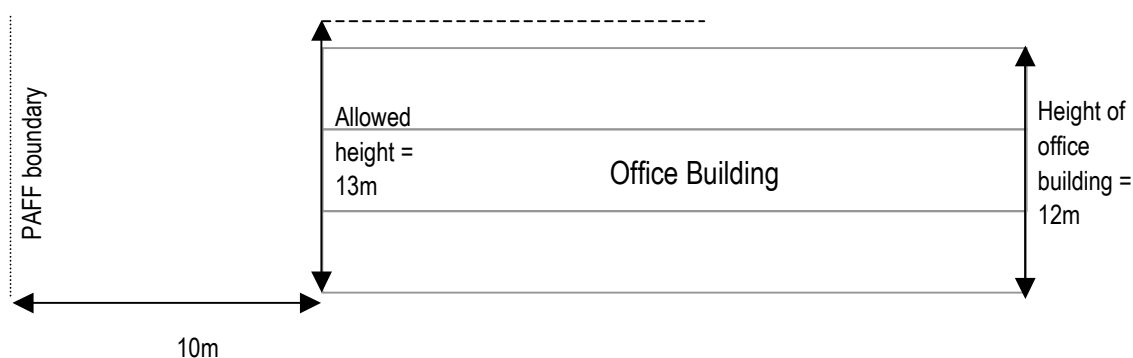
Cross-section View of the Office Building Showing Maximum Building Height
